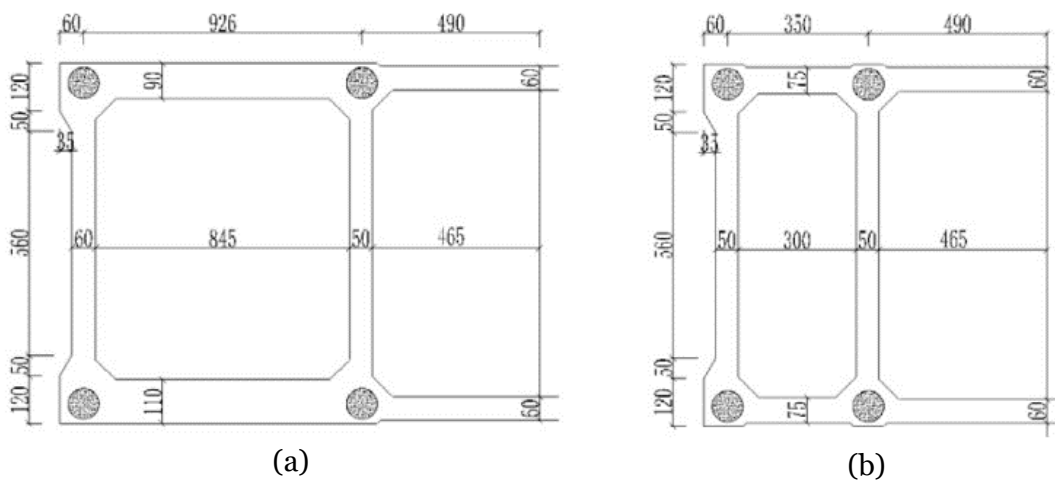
Cross section of the arch of Beipanjiang Bridge a) arch springing b) arch crown (adapted from [23])
